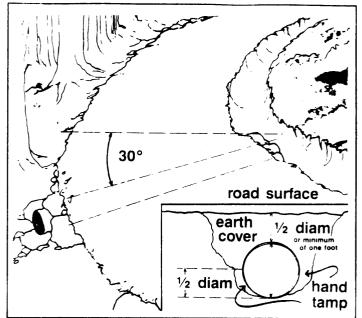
Design and installation of pipe culverts (Vermont Department of Forests, Parks and Recreation, 1987).
